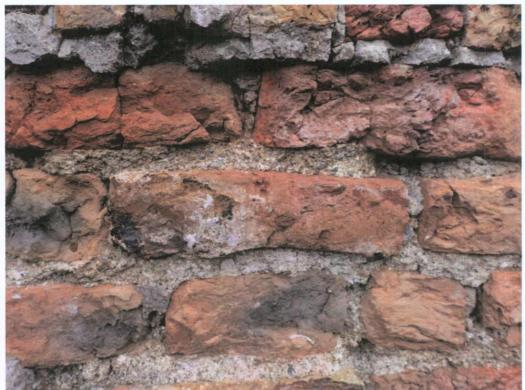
Detail of north elevation of No.10 Moore Street. The exposed brickwork consists of hand-made clamp-fired bricks showing a lack of sorting of the raw clay material, characteristic moulding and shaping defects, and both underfired and over-fired examples of brick. The bricks do not conform to standard imperial sizing.
